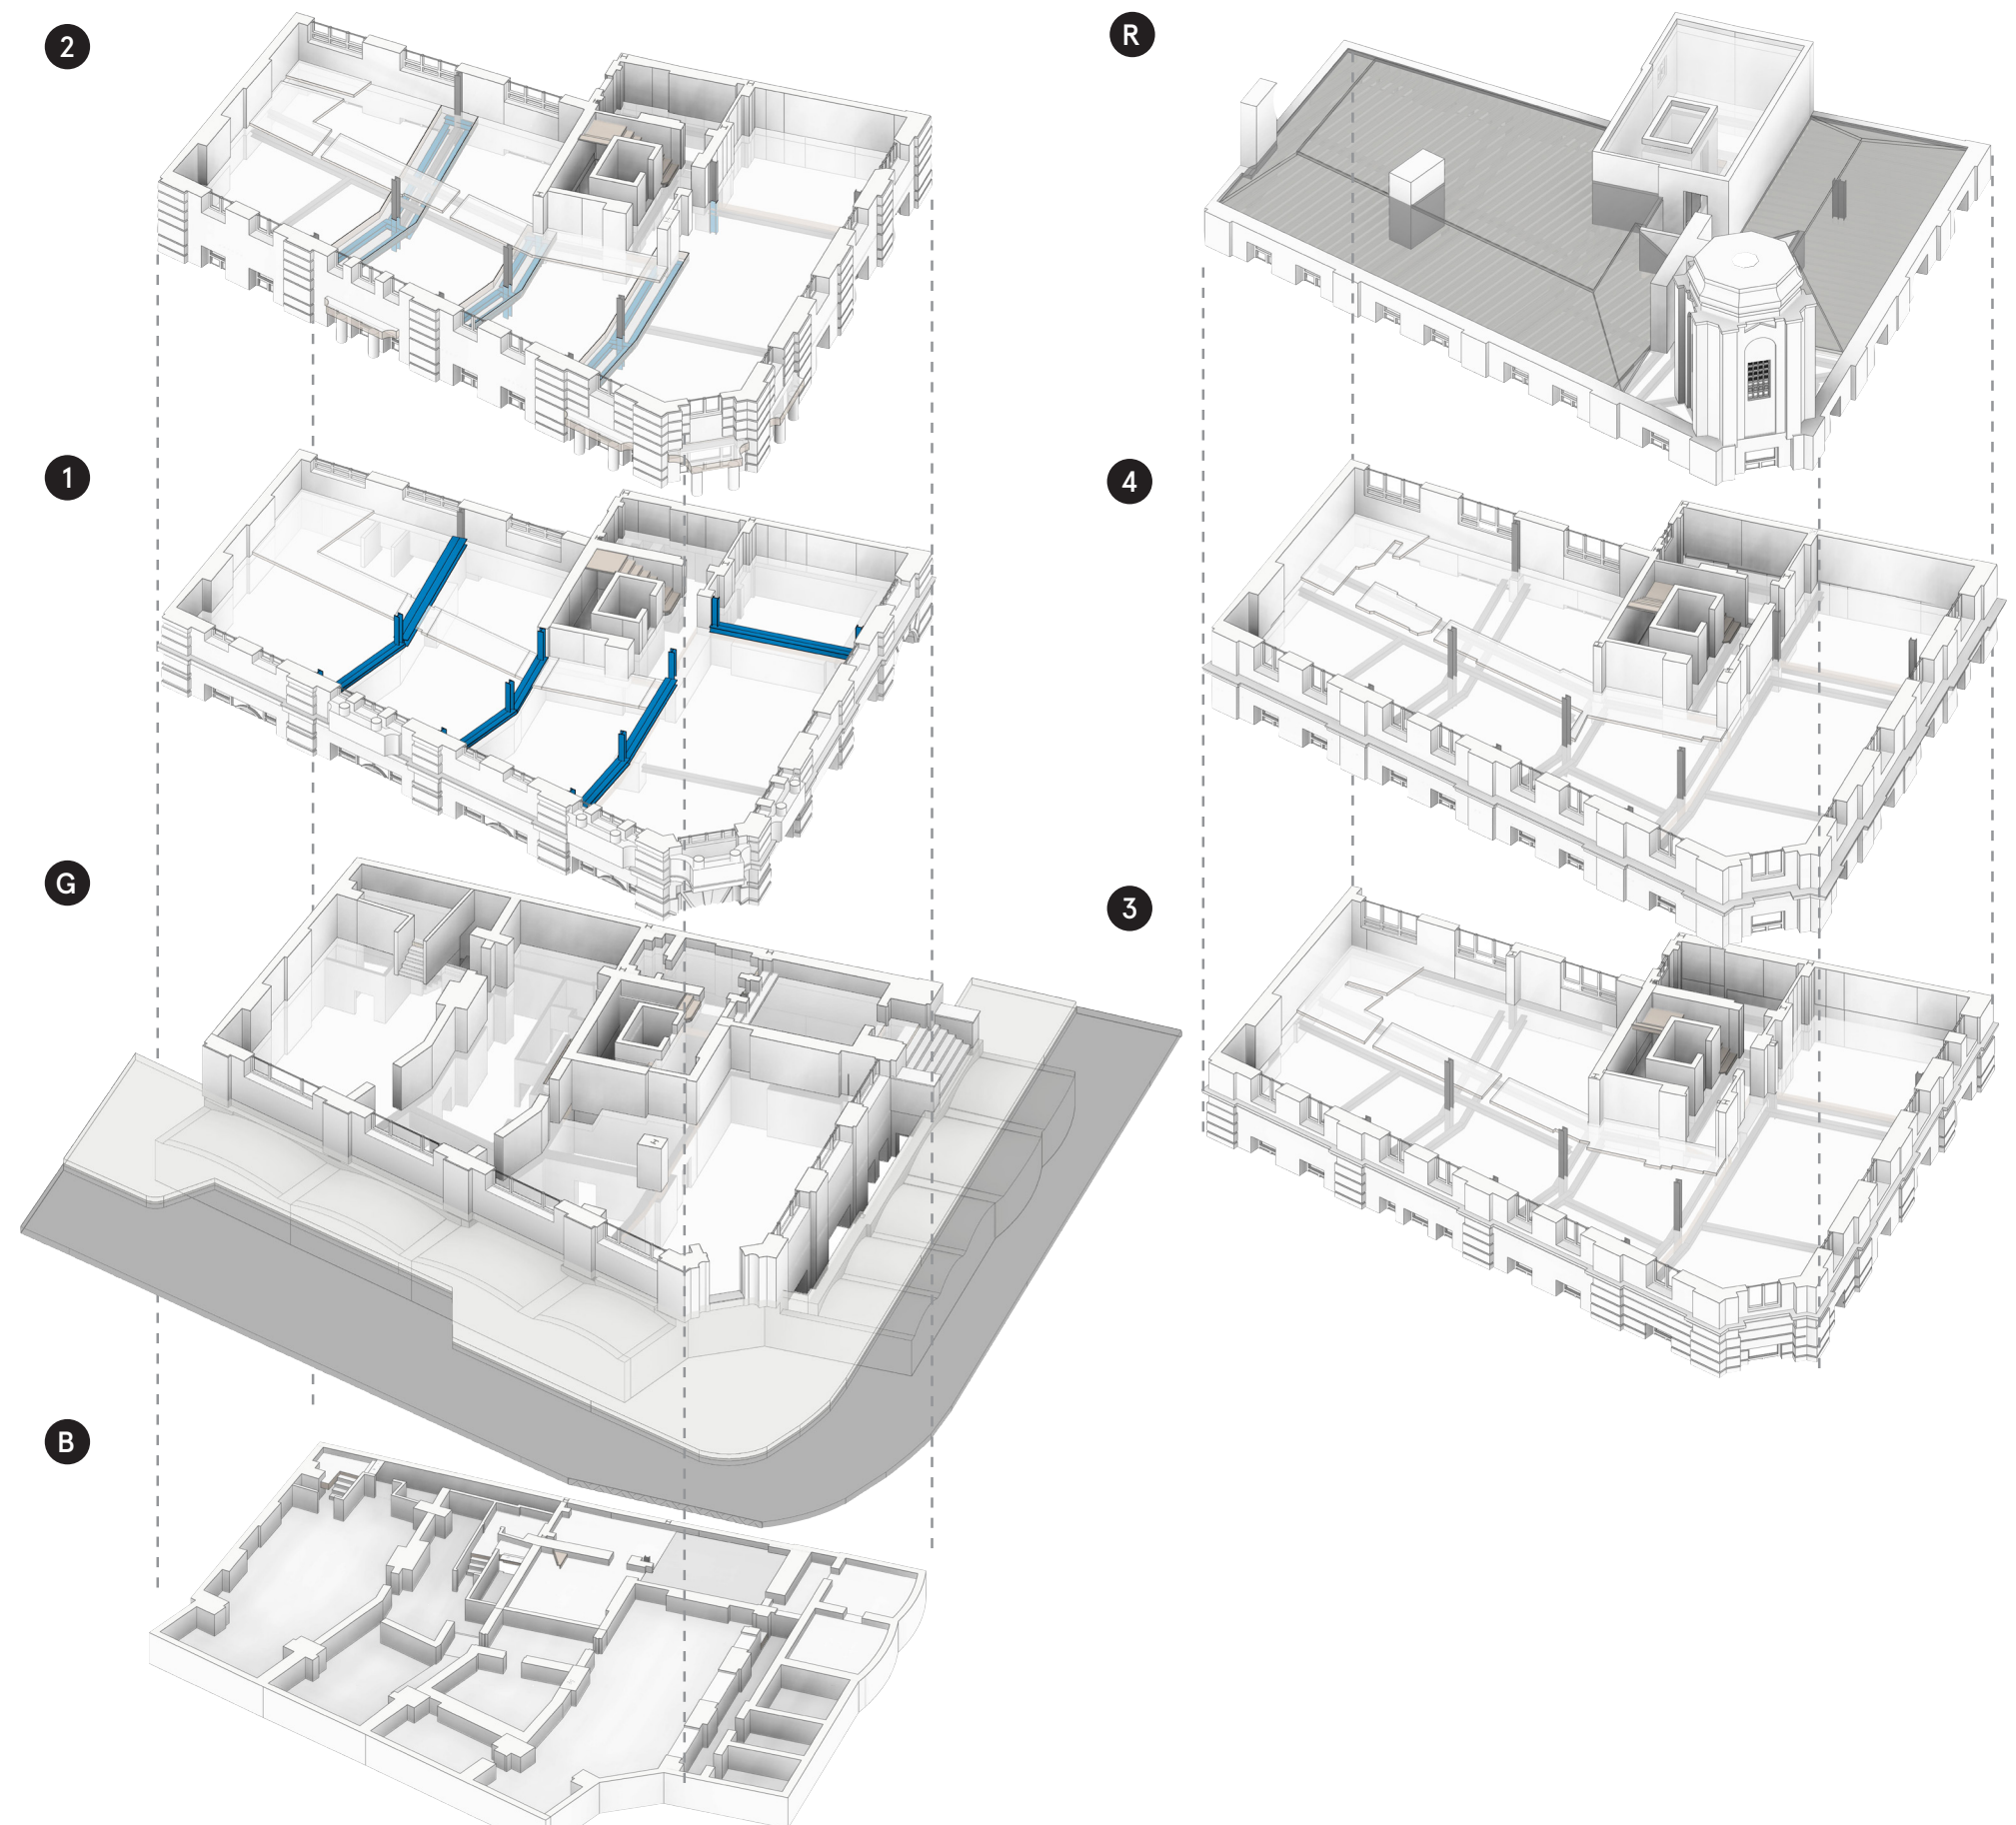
3D VIEW OF PROPOSED FLOORS
